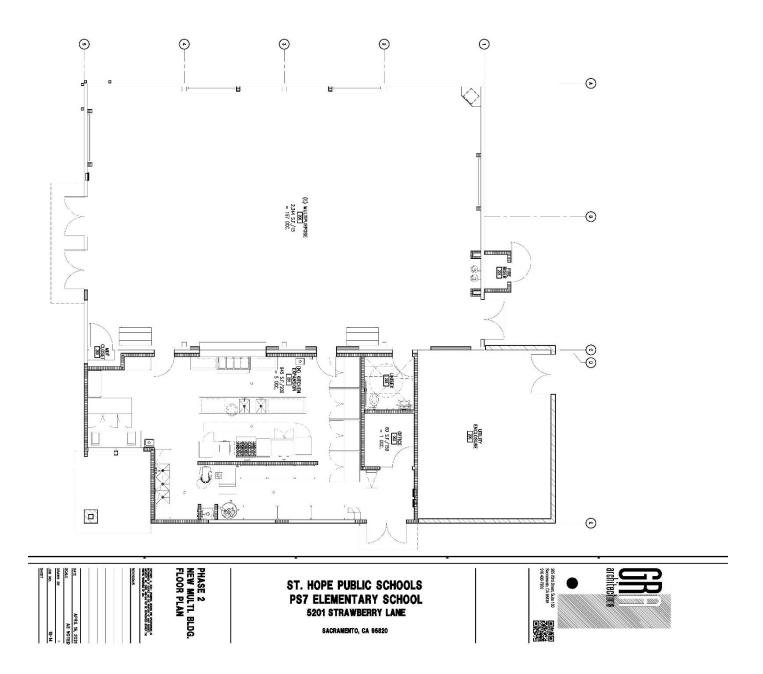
MULTIPURPOSE ROOM FLOOR PLAN Source: GRA Architecture
